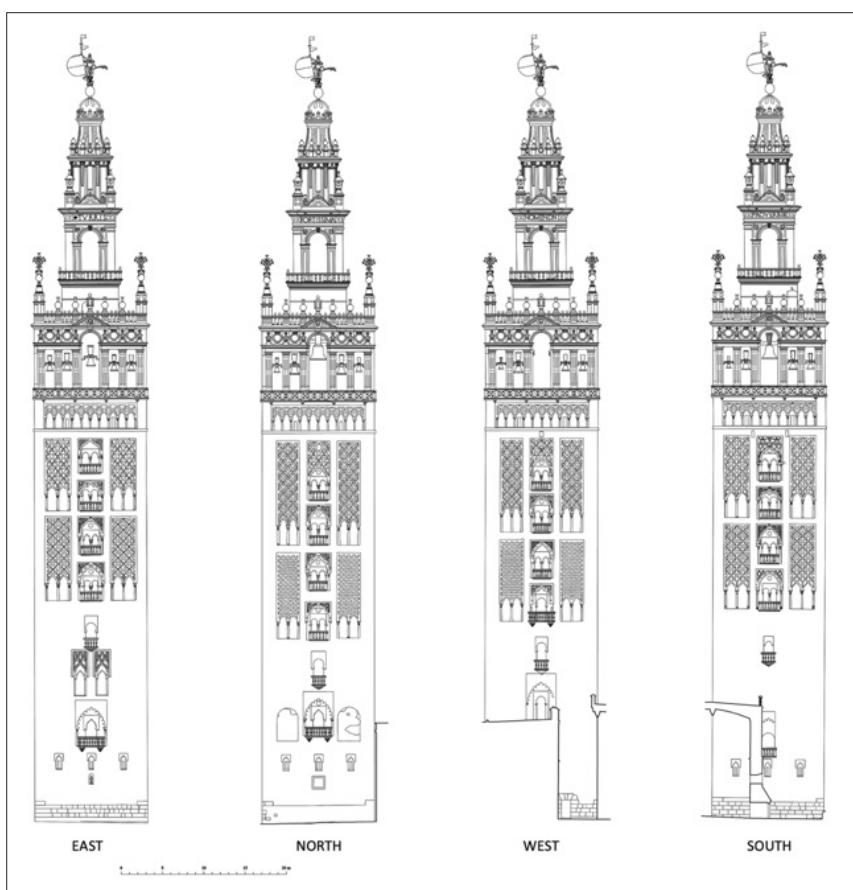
Elevation plans of the Giralda tower, in plans by Antonio Almagro Gorbea [9].
